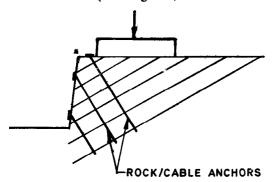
FOUNDATION OF STEEPLY DIPPING STRATA ON A BENCH
